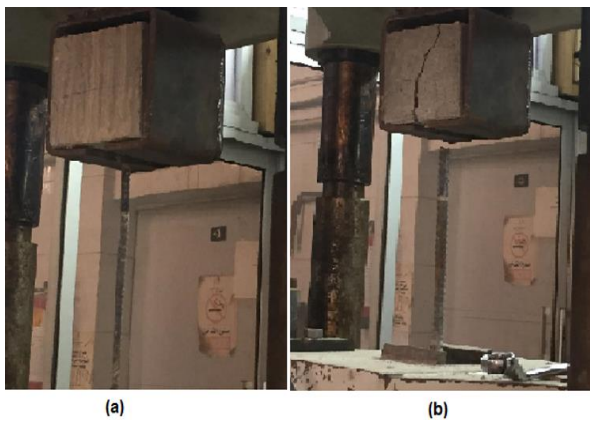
Modes of failure (a) pull out failure (b) splitting failure
